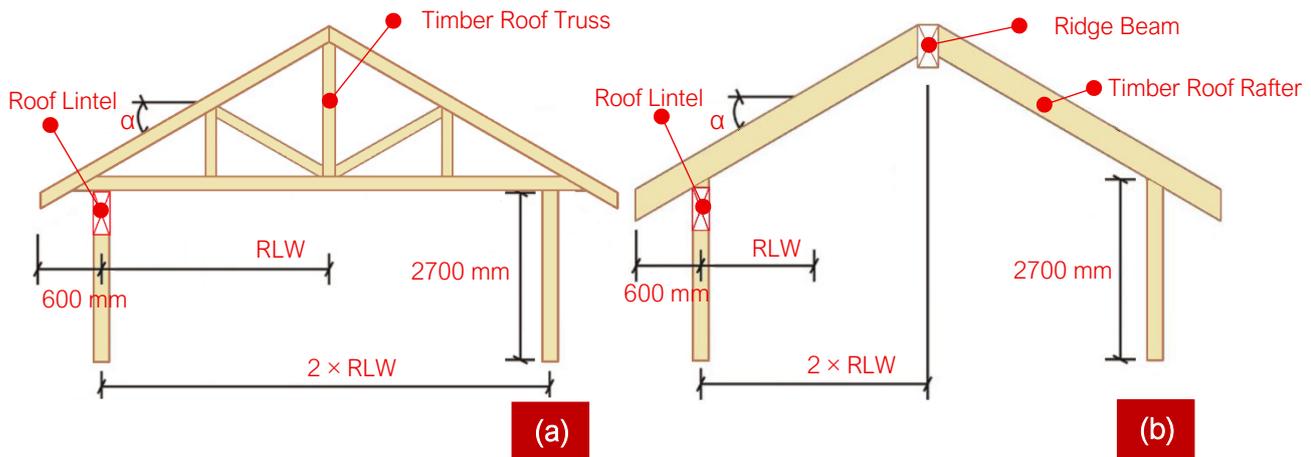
Red Stag Vertix₂₀ roof lintel beam; a) Timber roof truss, b) Timber roof rafter.
